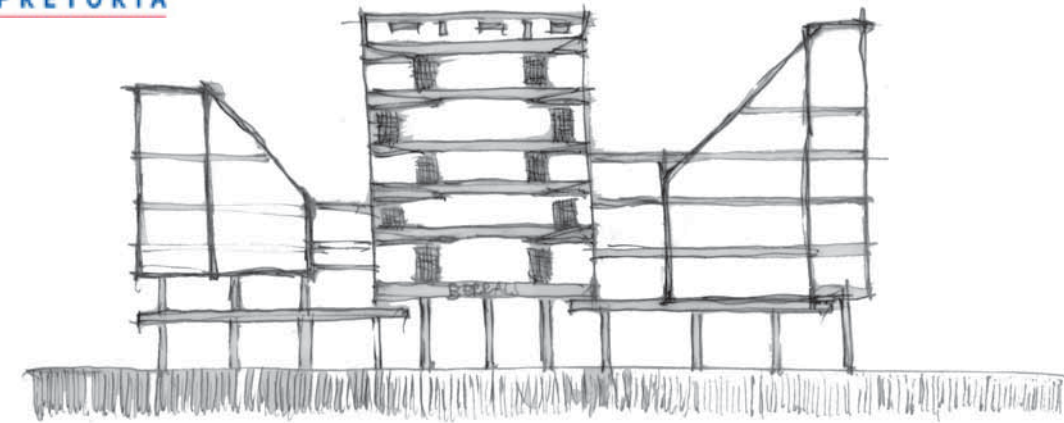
East elevation (front facade of Berrals) - The new intervention plugging into the Berrals building on the northern and southern facades (Author, 2010).
